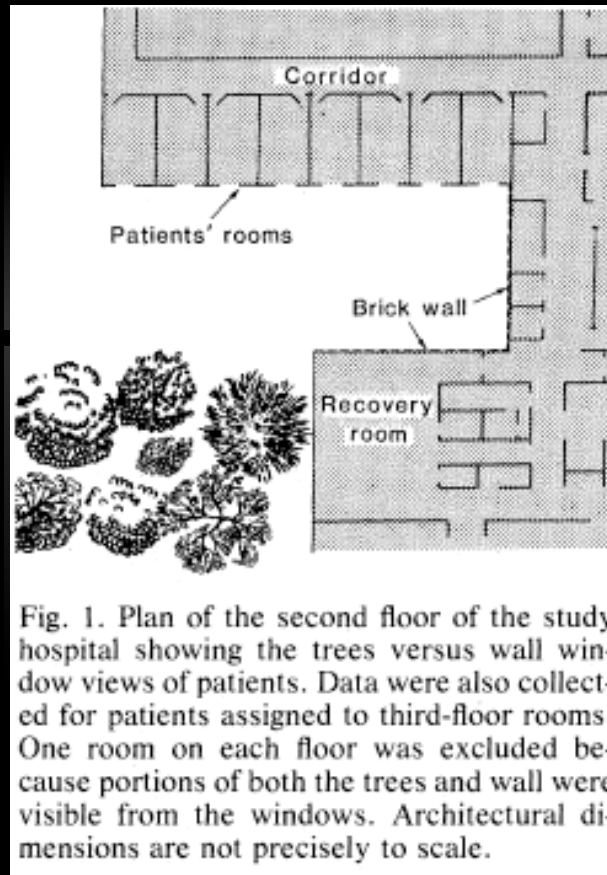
Plan of the second floor of the study hospital showing the trees versus wall window views of patients. Data were also collected for patients assigned to third-floor rooms. One room on each floor was excluded because portions of both the trees and wall were visible from the windows. Architectural dimensions are not precisely to scale.
